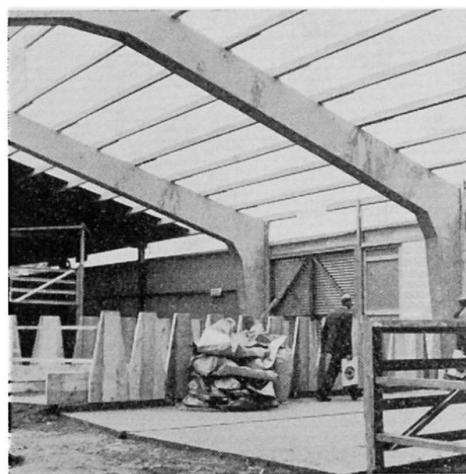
Two-hinged arches made of three parts. The joints are made as shown in Fig. 5.
